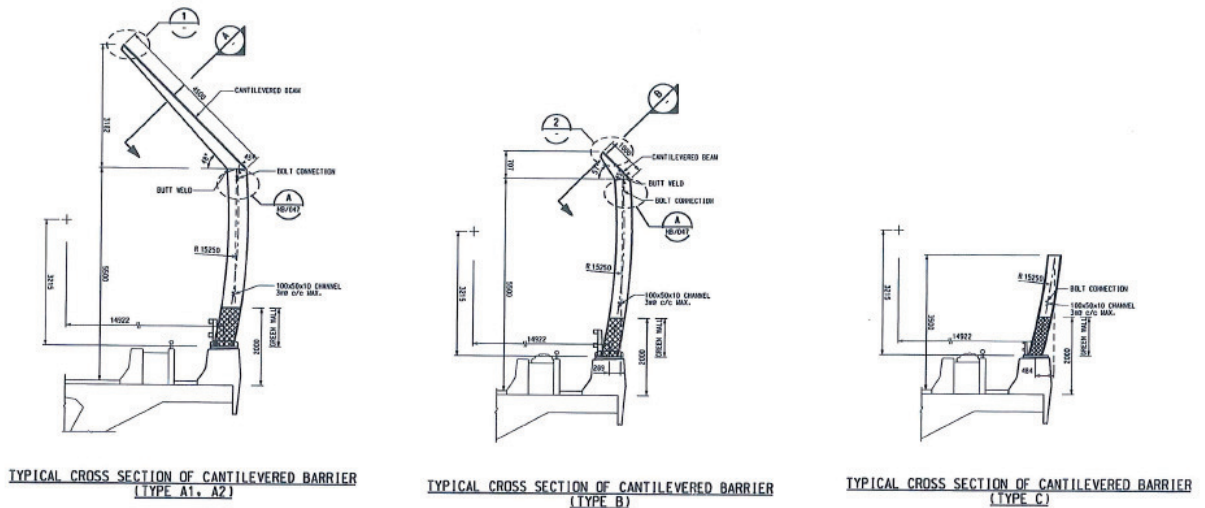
Sections of 3 Types of Cantilever Noise Barrier
